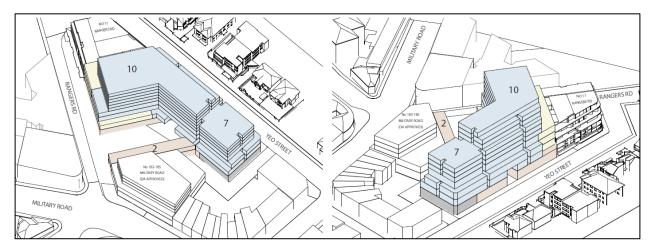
Proposed building massing diagrams (source: Koichi Takada Architects (KTA) urban design report)
